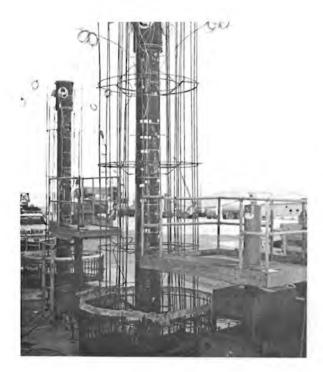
Concrete Silo Liners on Pads During Rebar Installation
